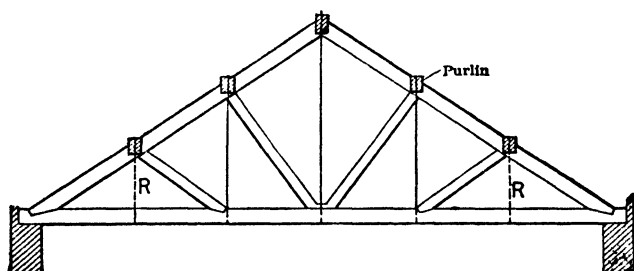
Six-panel Triangular Howe Truss Spans from Thirty-six to Fifty Feet
